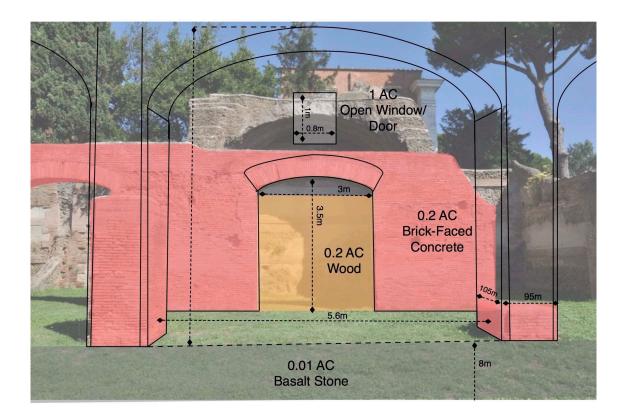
Portico di Pio IX façade with NCR ratings and measurements. (Author)
